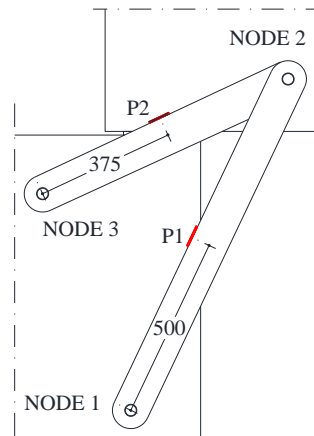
Geometrical layout of the strain gauges on the steel profiles (dimensions are expressed in mm)
